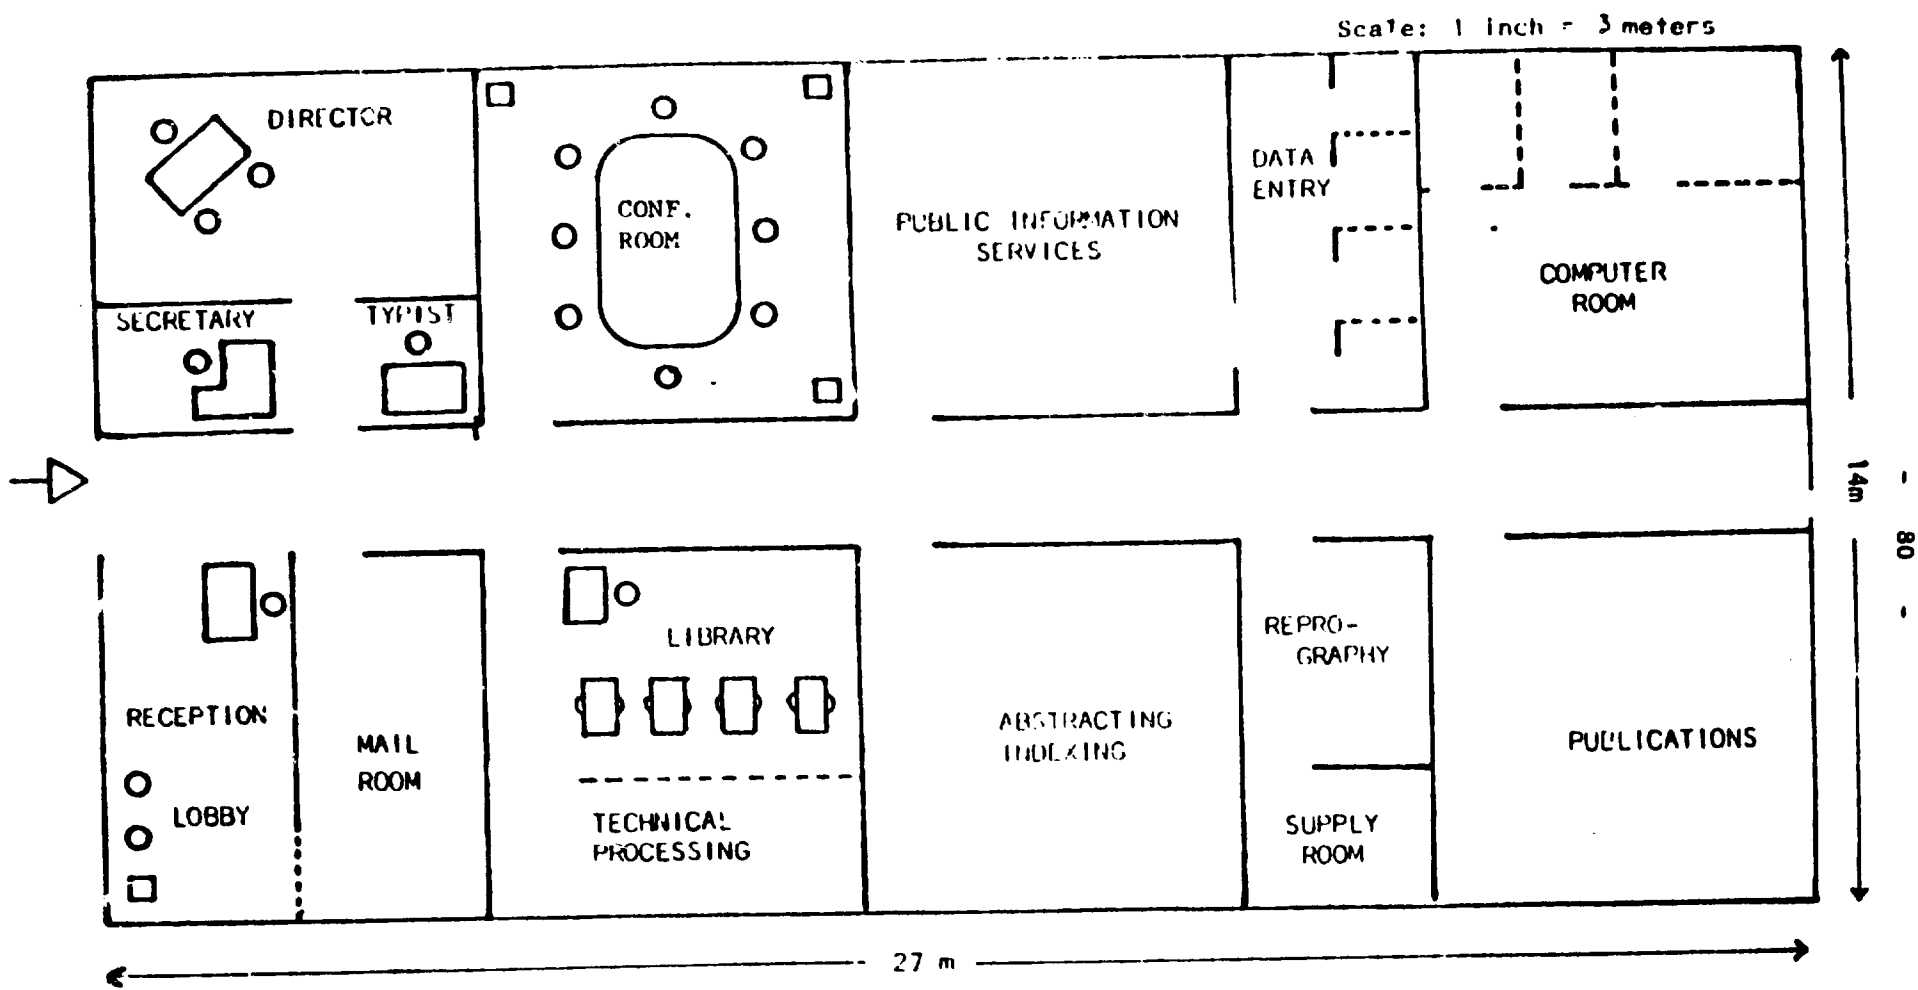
SECTORAL INFORMATION SERVICE: TYPICAL FLOOR PLAN
